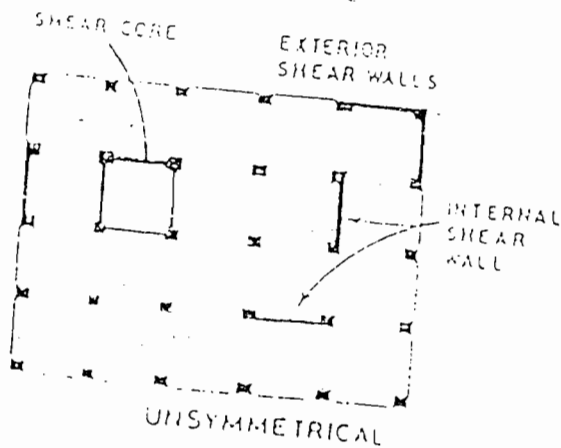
Typical Framing Plan Of Multistorey Building Composed Of Shear wall.
